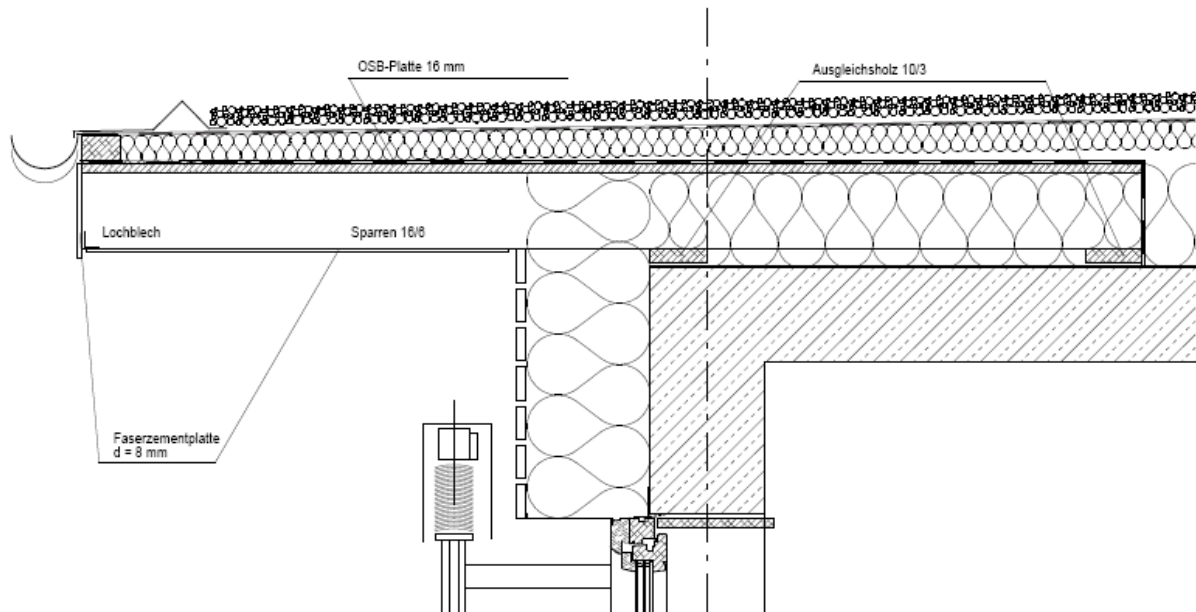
Unventilated flat roof with solid supporting construction and thermal bridge minimised overhang. Albert-Einstein-Schule in Schwalbach. HeimeI + Wirth - Architekten, Frankfurt. (Source: HeimeI + Wirth Architekten)
